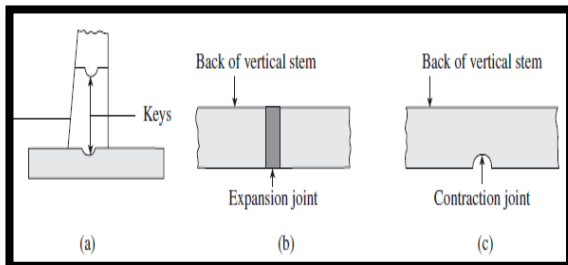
Joints in Retaining Walls: (a) Construction (b) Expansion (c) Contraction, [5]
